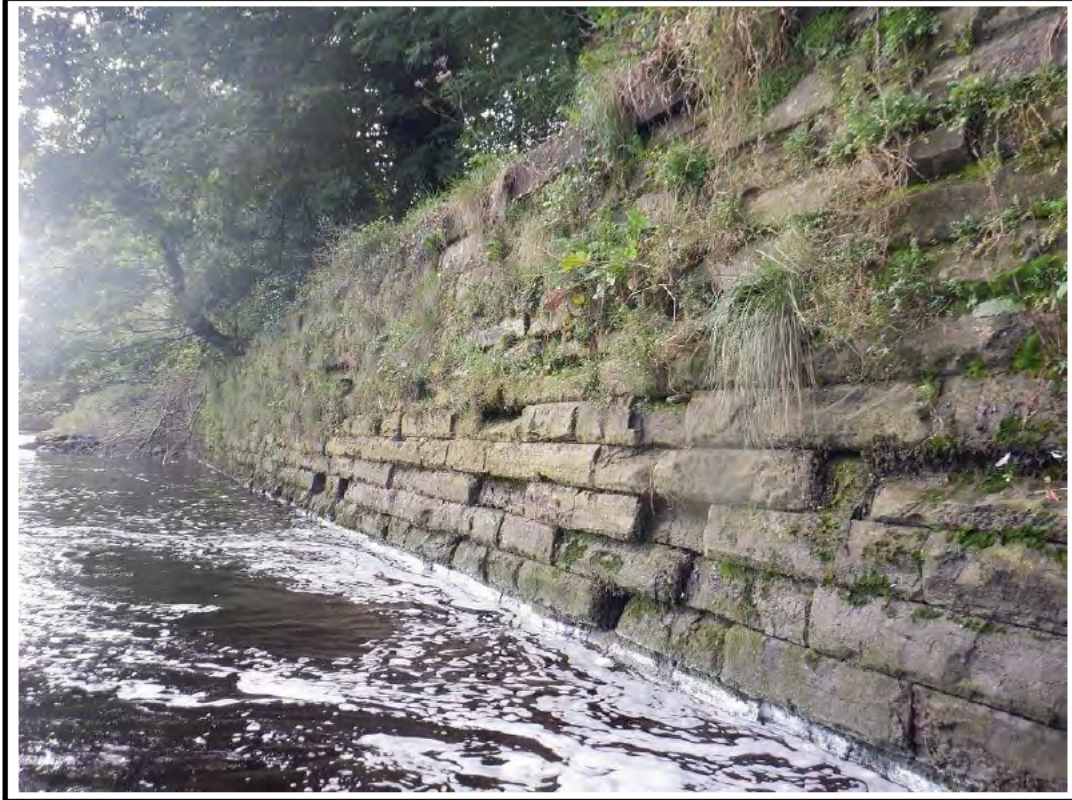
P13 - DOWNSTREAM LM RETAINING WALL 14/09/20
